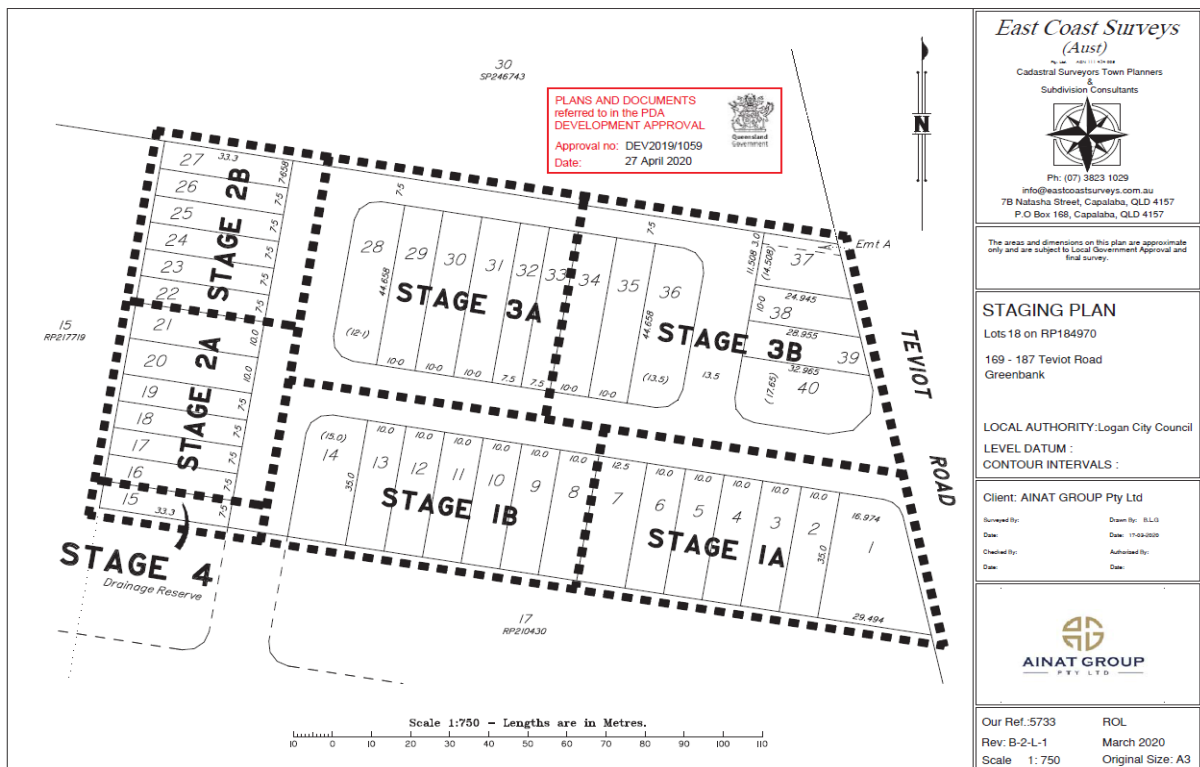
Approved 40 lot subdivision over 169-187 Teviot Road, Greenbank
